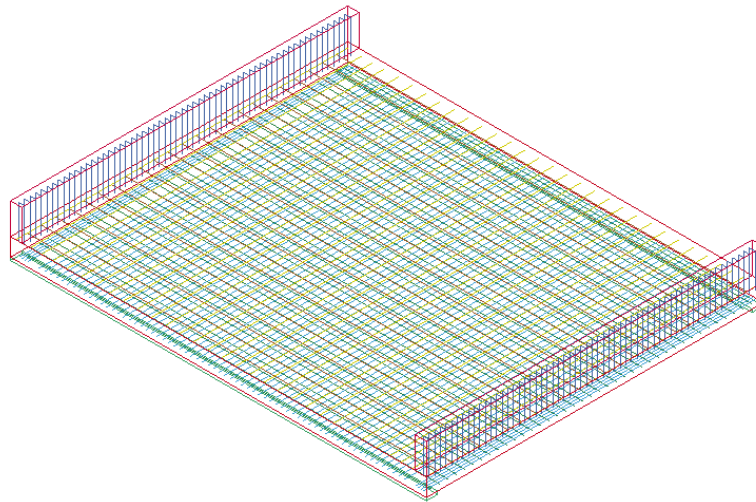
3-D View of Rebars in the Archetype 1 Bridge Model.
